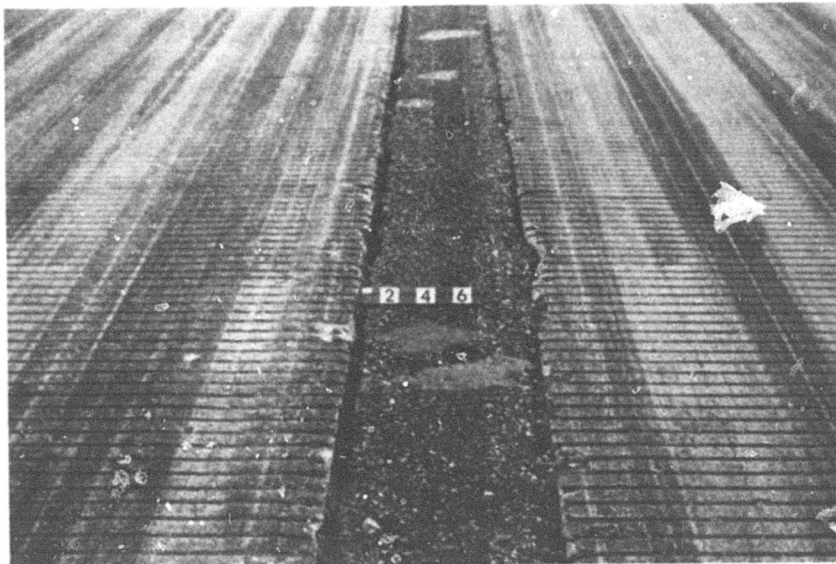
Chicago Midway Airport -- Joint spall repair made with bituminous mixture.
